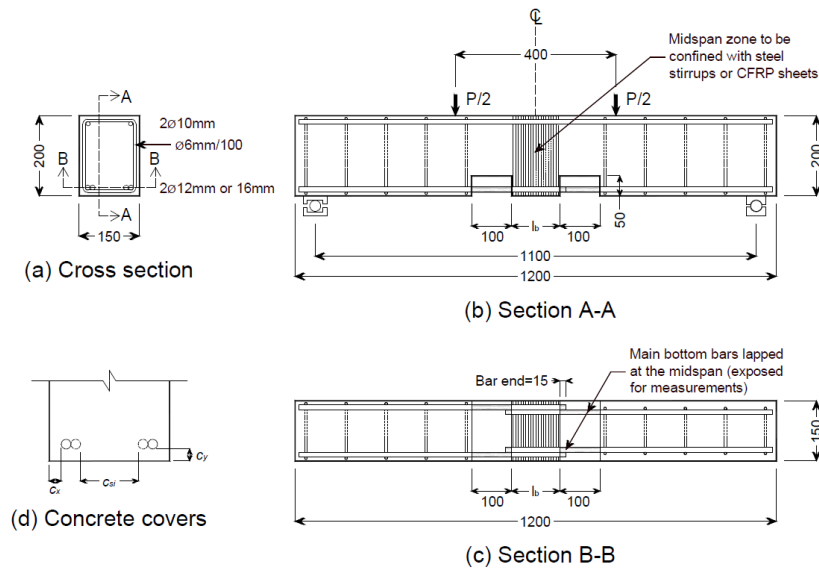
Beam splice specimen tested by Garcia et al. [53].
